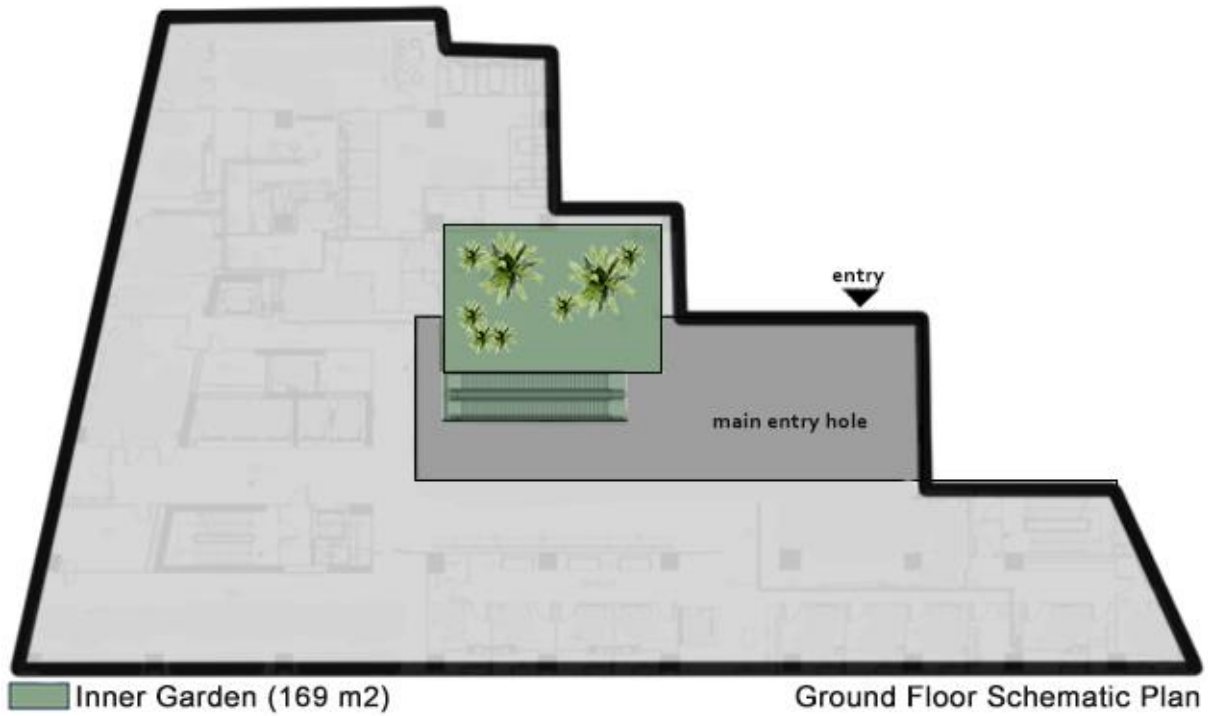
Ground Floor Schematic Plan (Designed by Author, 2024)
